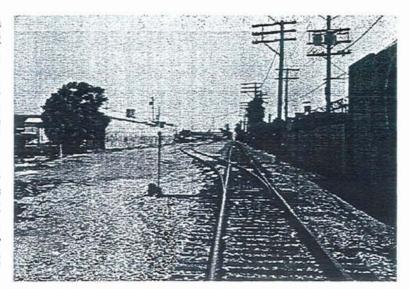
Potential layover and maintenance yard location at Van Ness Avenue looking east
